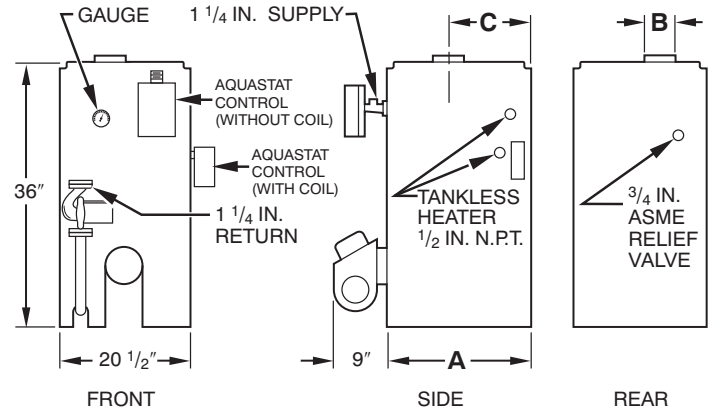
Fig. 3 - Models BW4 and BW5 Dimensions
